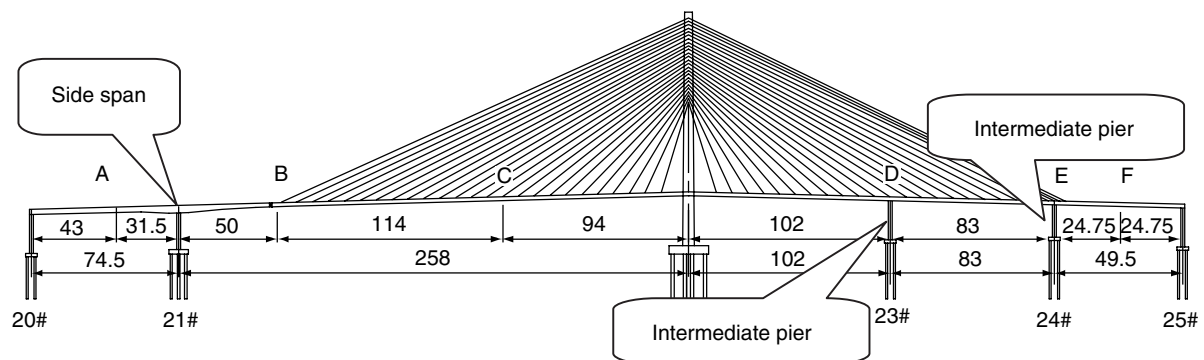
Profile of the study bridge (engineering drawing of design scheme, unit: m)
